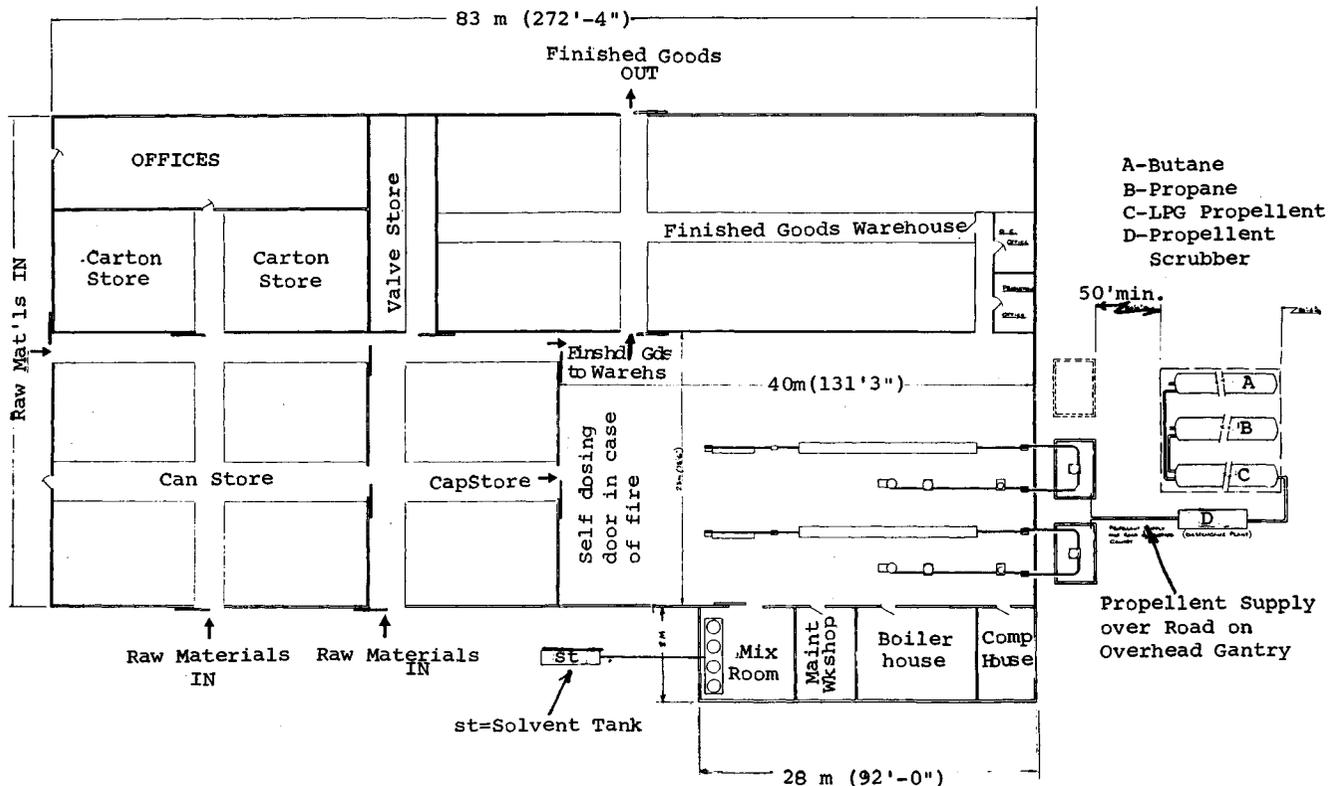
Floor Plan for a Typical European-Style Filling Plant with Two Aerosol Filling Lines and Provision for a Third Line
